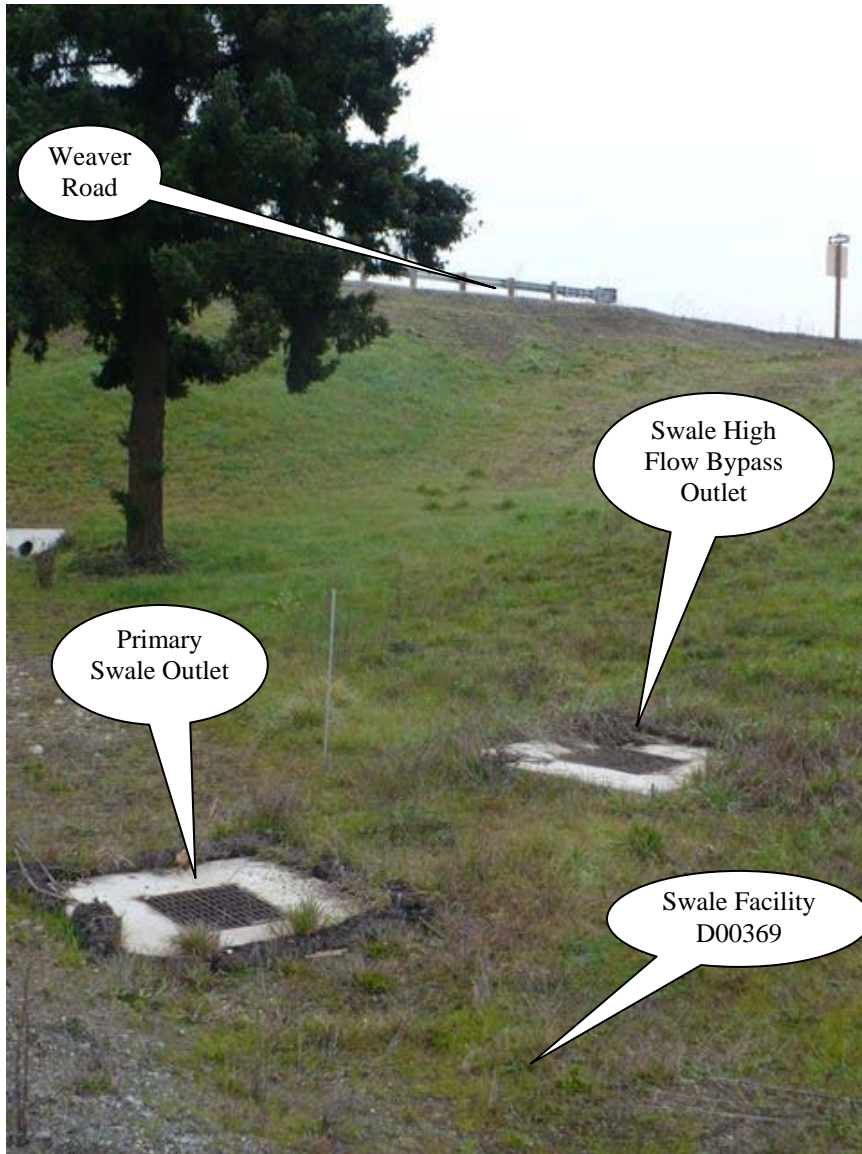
Looking at the facility outlet control structure. Water is conveyed from the primary swale outlet to the high flow bypass outlet, and then routed north under the Weaver road overcrossing via an 18-inch storm pipe.
